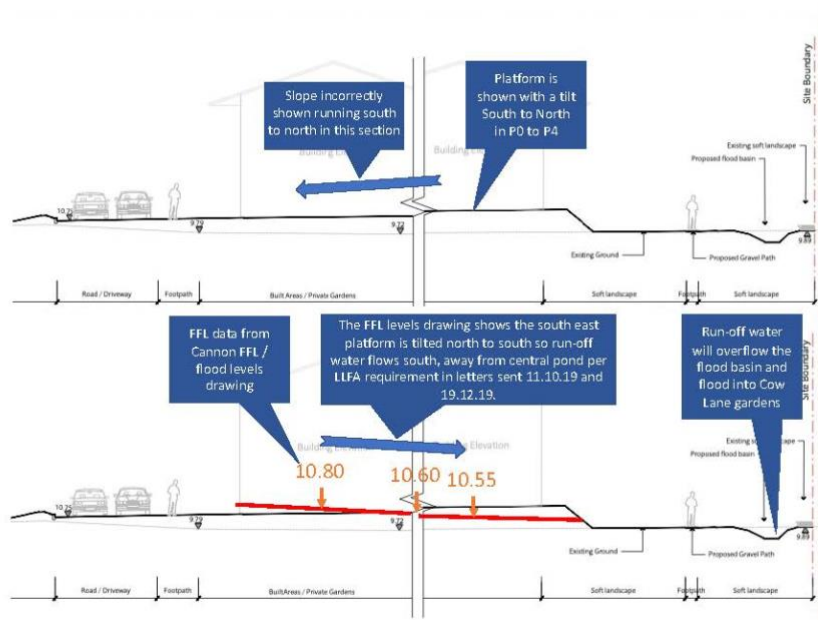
Serial section amended by Rule 6 party (red line) to match the appellant's site plan produced on 14.04.21.
